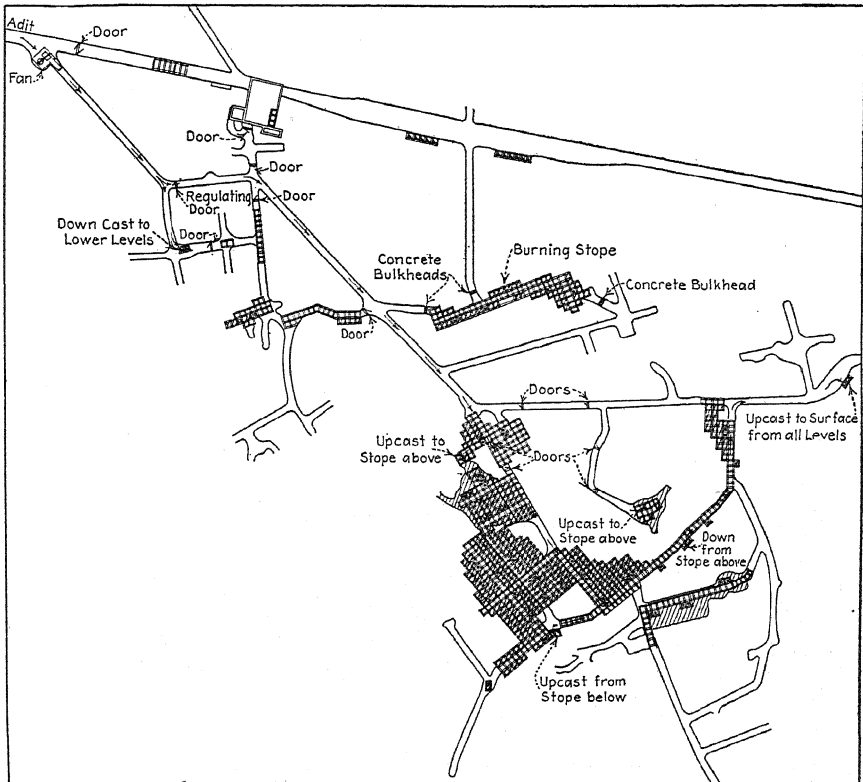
PLAN SHOWING LOCATION OF FAN AND THE METHOD OF VENTILATION.
